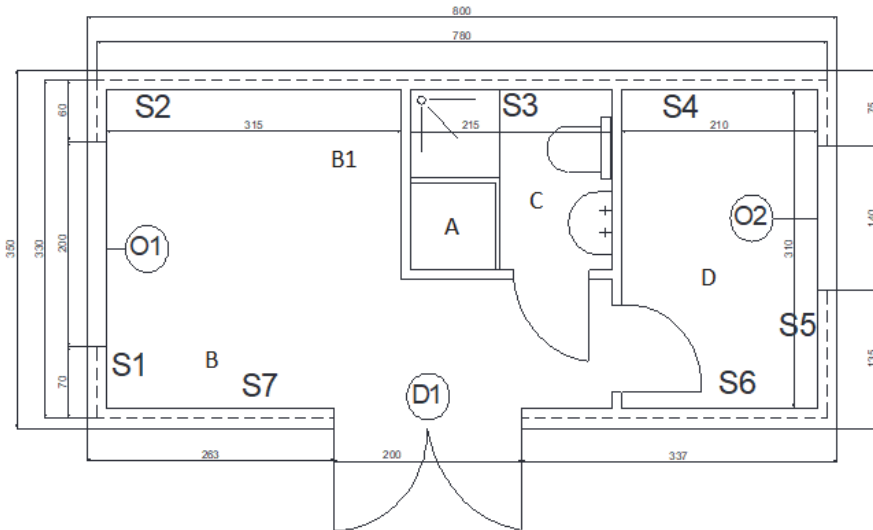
An exemplary scheme of the layout residential WH object rooms mounted on the float 3.5 x 8 m; A – technical room for the heat pump, B – livingroom, B1 – kitchenette, C – bathroom and toilet, D – bedroom
